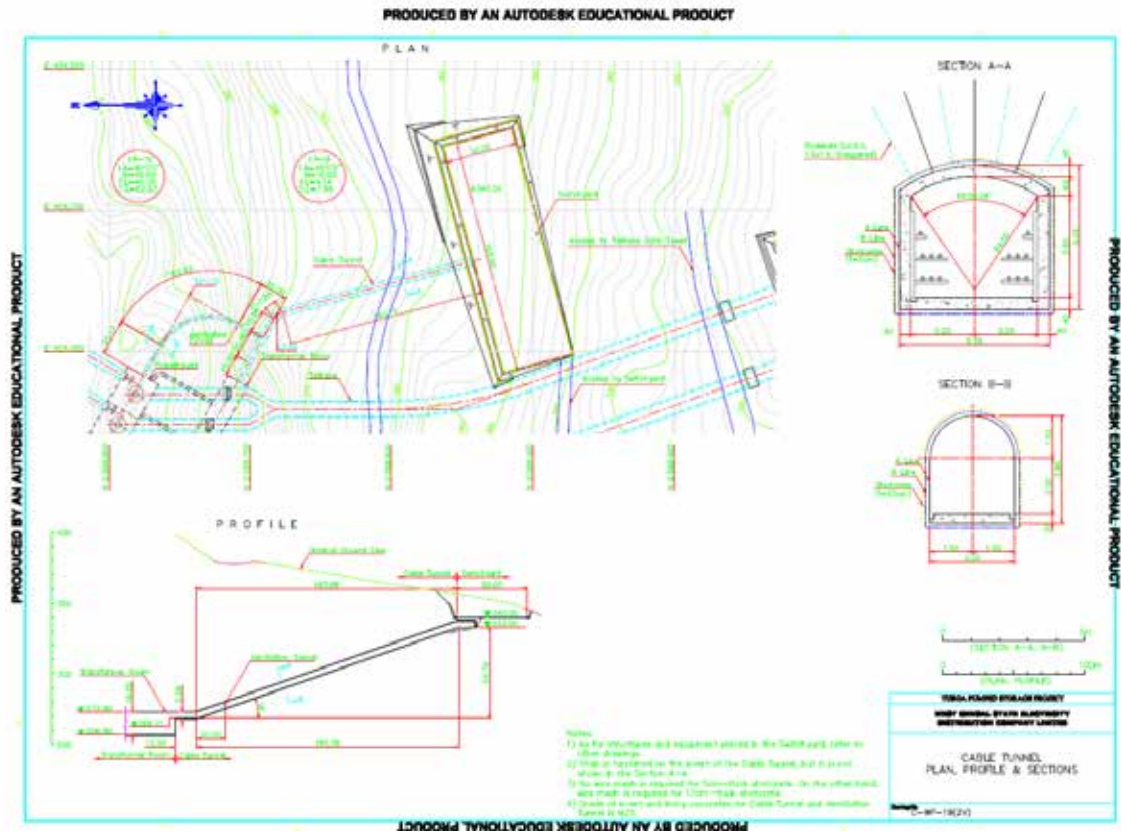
Cable Tunnel Plan and Section, Switchyard Plan
